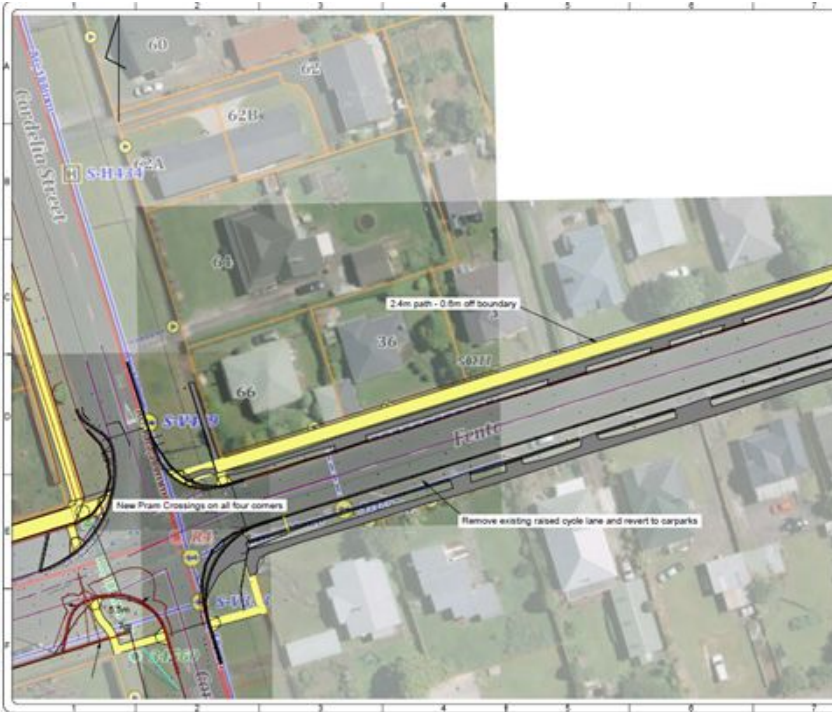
Concept plan – Shared use Footpath / Cycleway on Fenton Street at the intersection with Cordelia Street
